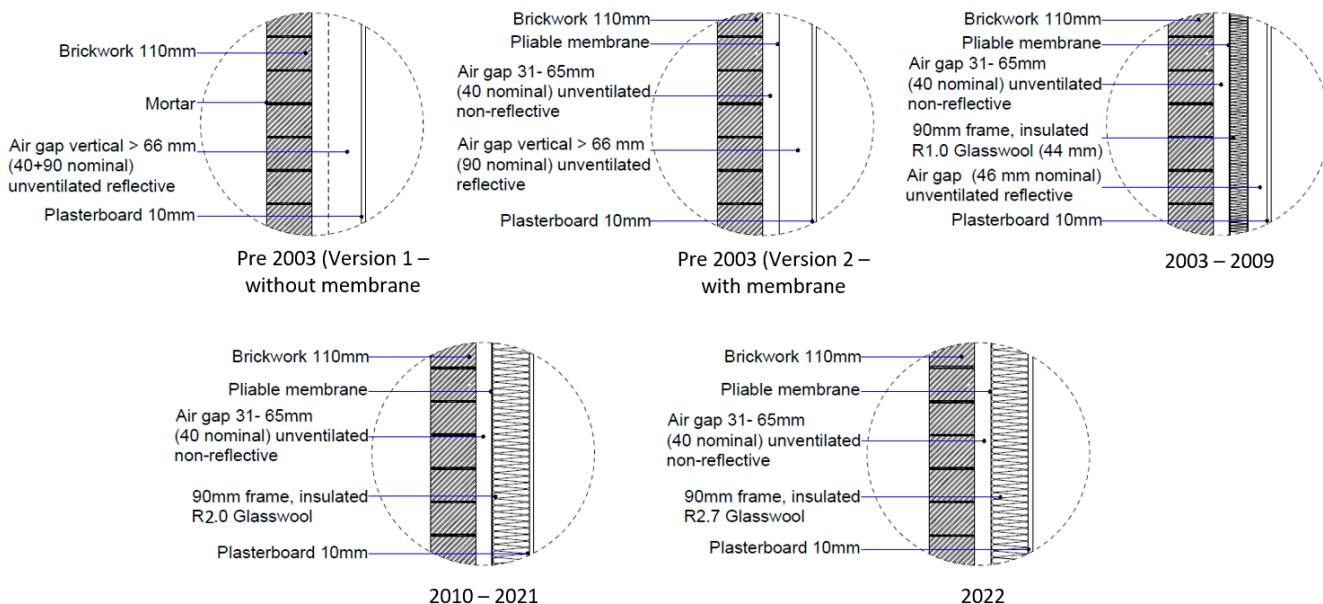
Sectional details of the clay masonry veneer wall in the NCC climate zone 6.
